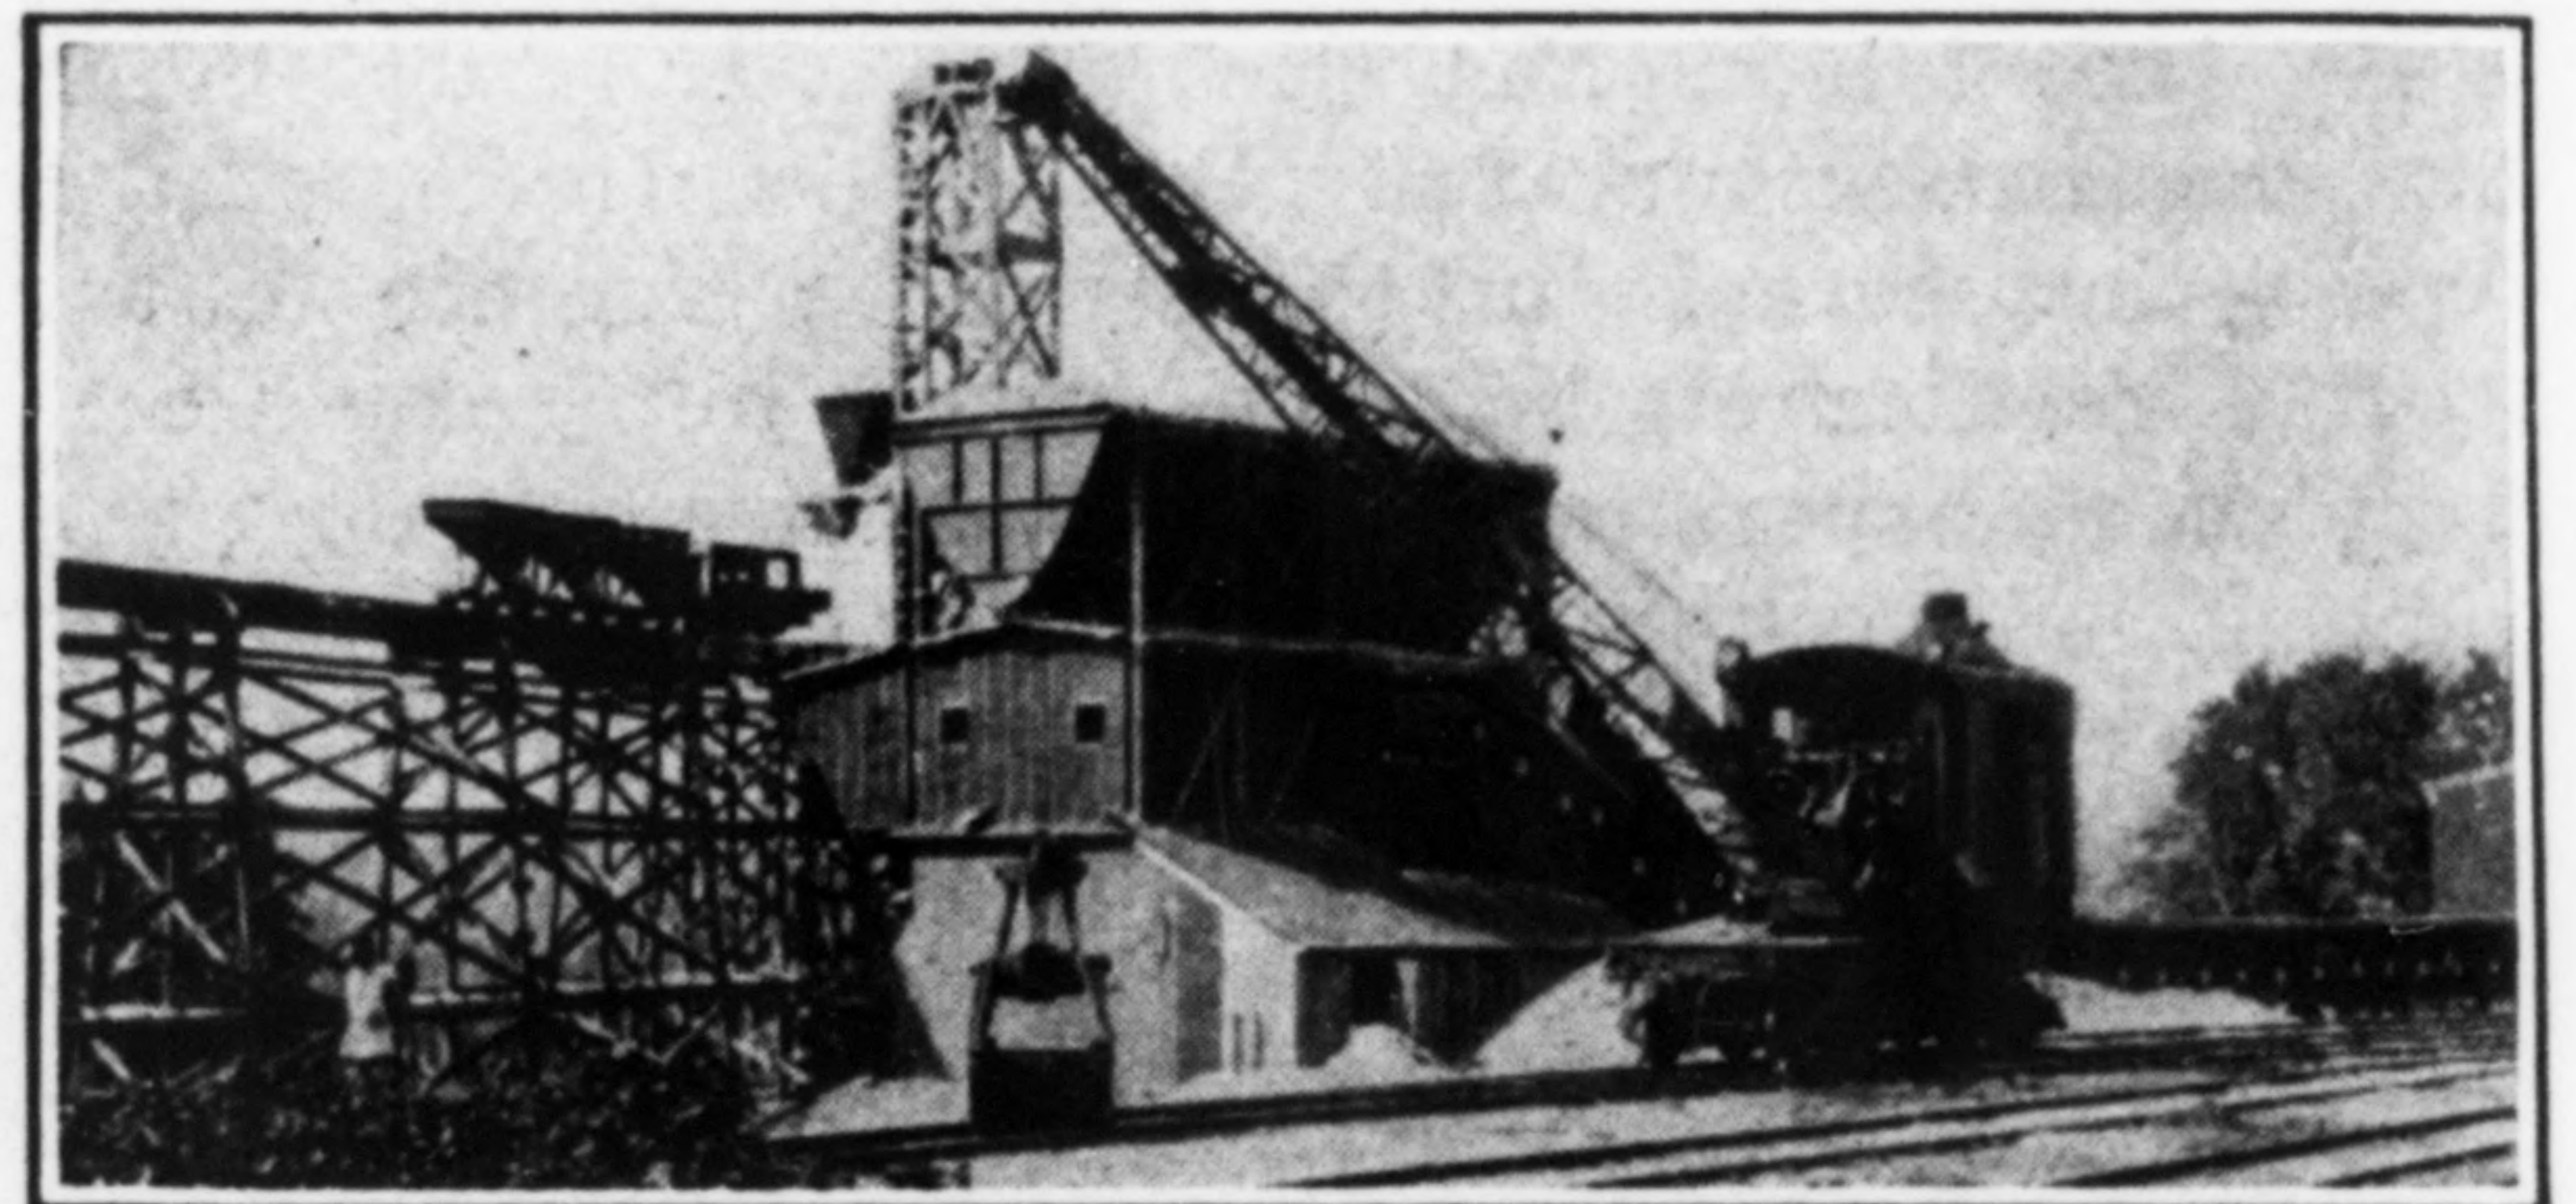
CONCRETING PLANT FOR FORT SNELLING-MENDOTA BRIDGE
